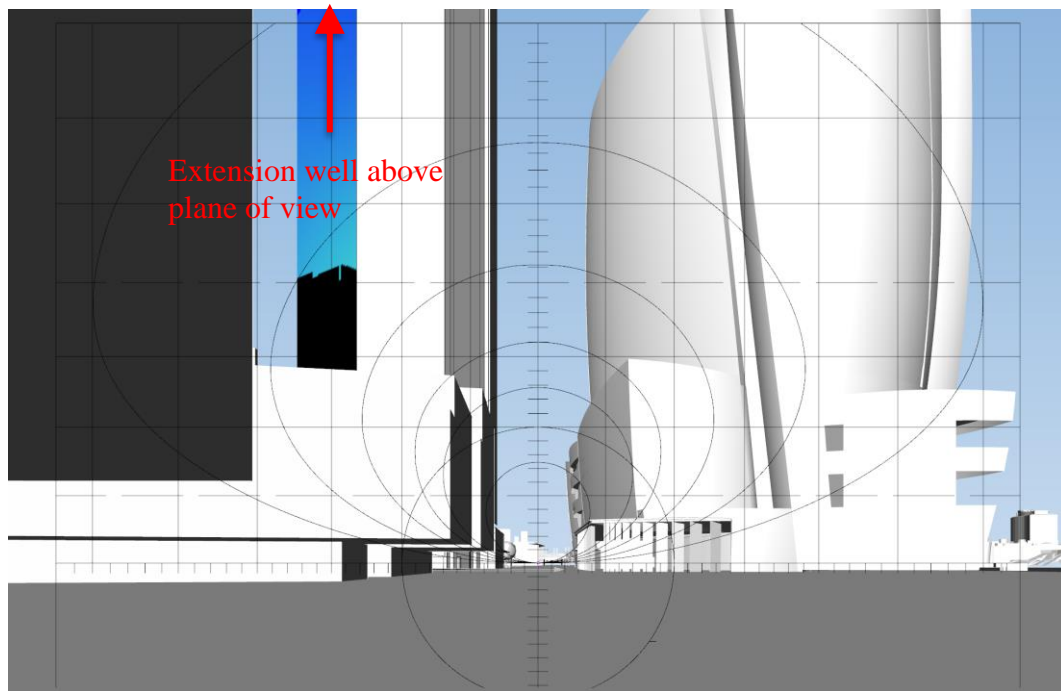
Perspective view from Barangaroo Avenue – north east façade
